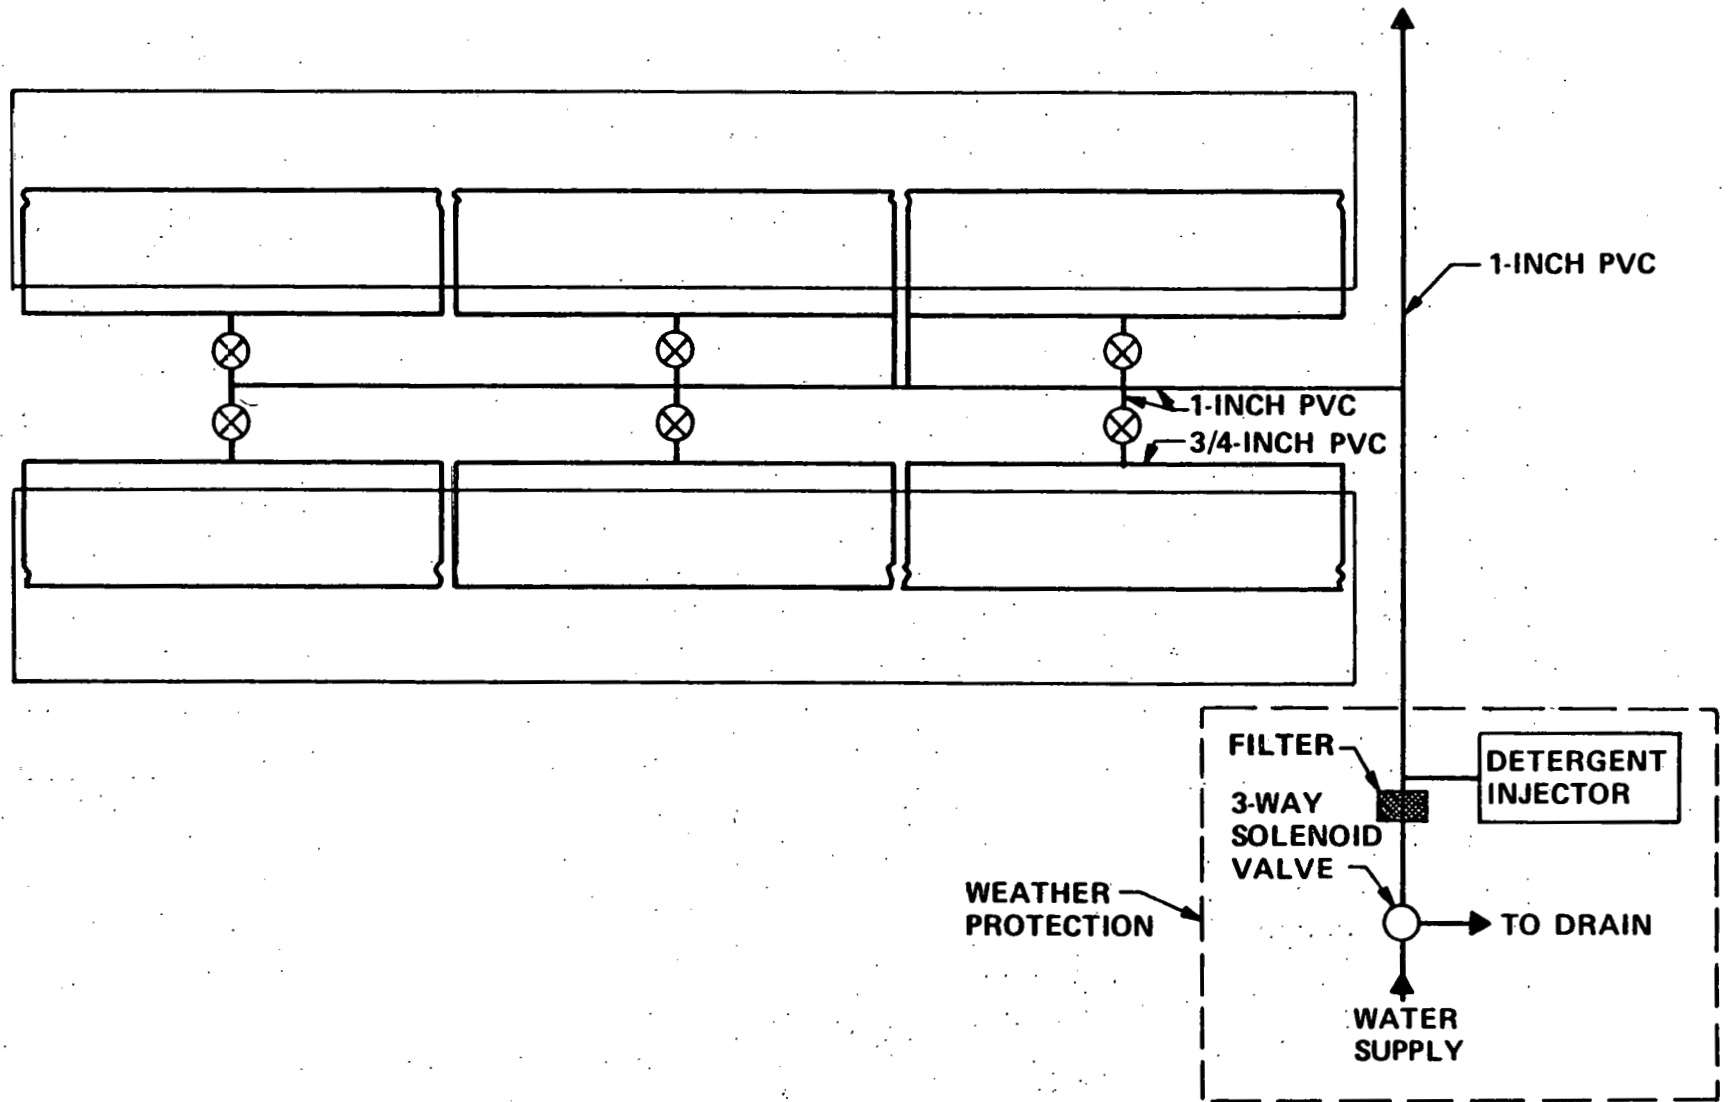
TYPICAL WATER DISTRIBUTION LAYOUT
